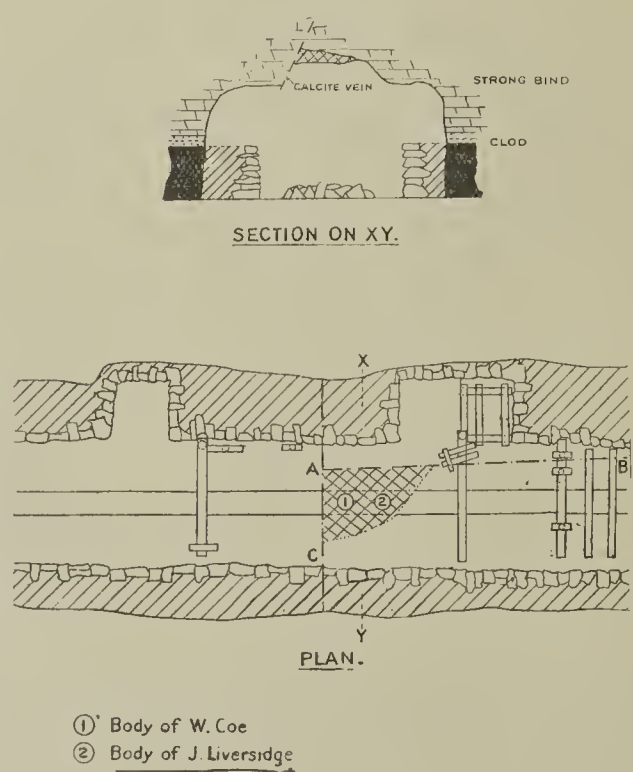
SKETCHES ILLUSTRATING FALL OF ROOF AT TINSLEY PARK COLLIERY.
